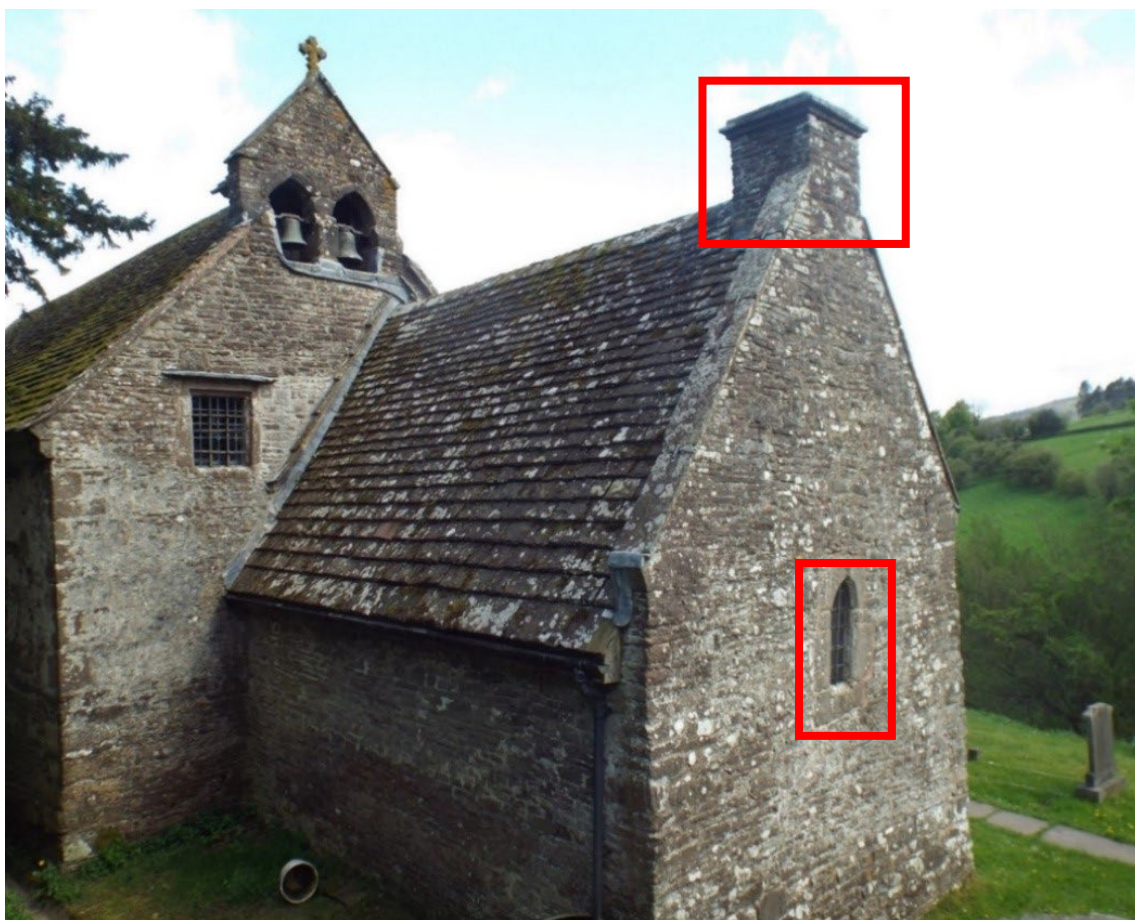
External view of cell showing chimney and high window on south wall (indicated in red).
